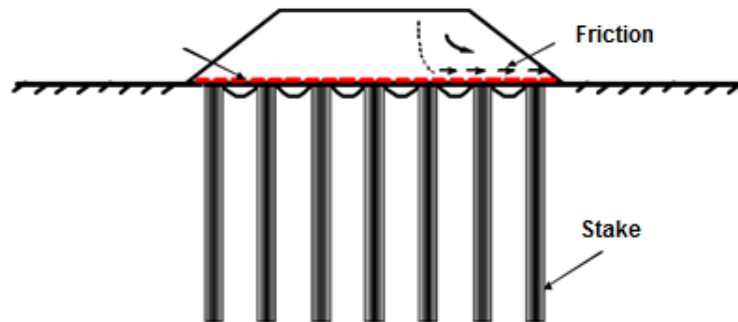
Reinforced piling embankment. (International Geosynthetics Society-IGS. 2005).
